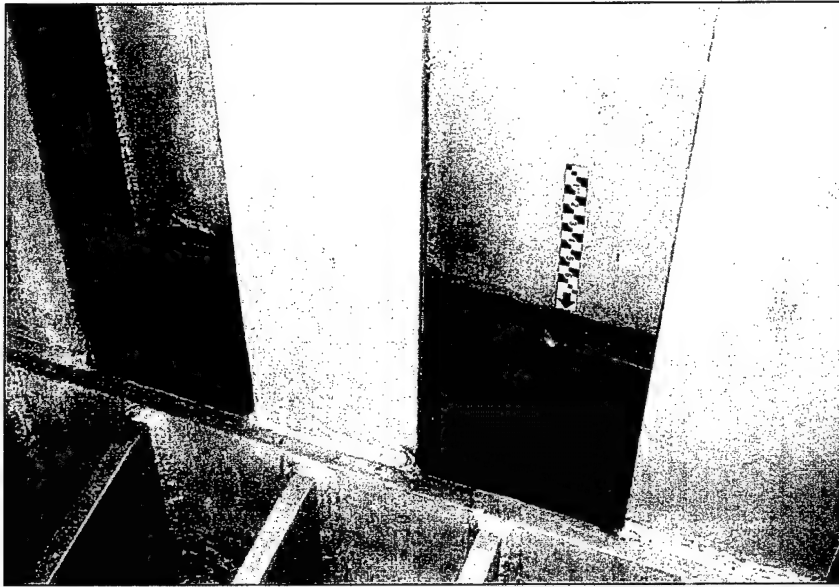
Standing water between stiffeners at ends of bottom horizontal girder, typical.
